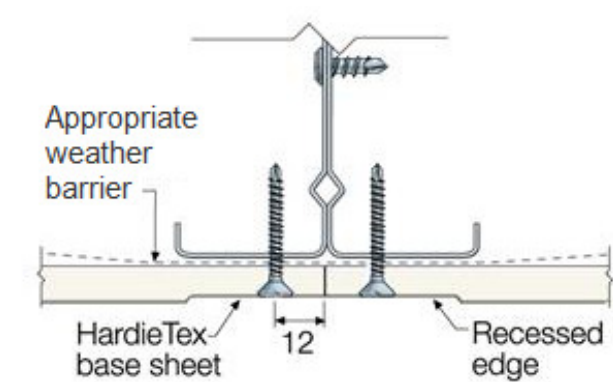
Sheet Joint on Steel Framing at Double Stud (thermal break, not shown, may be required)
